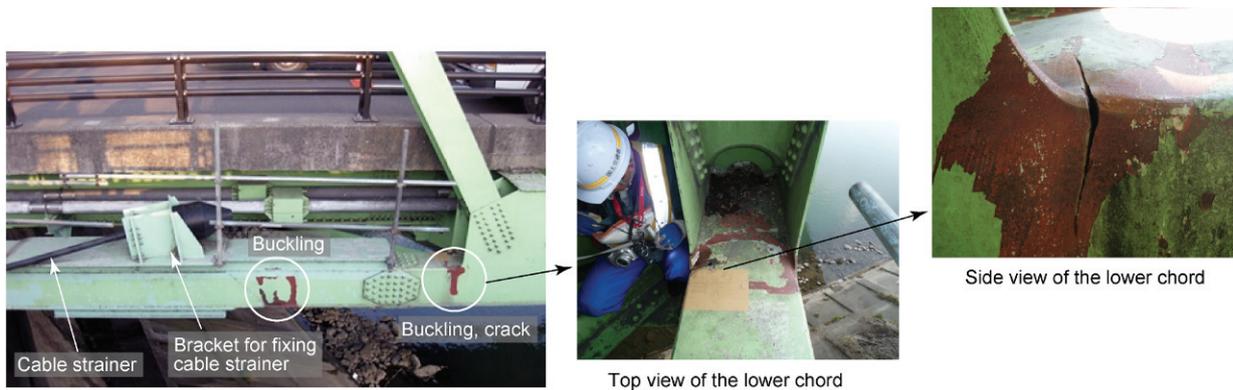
Damage of the lower chord of truss bridge (Osaragi Ohashi Bridge)
